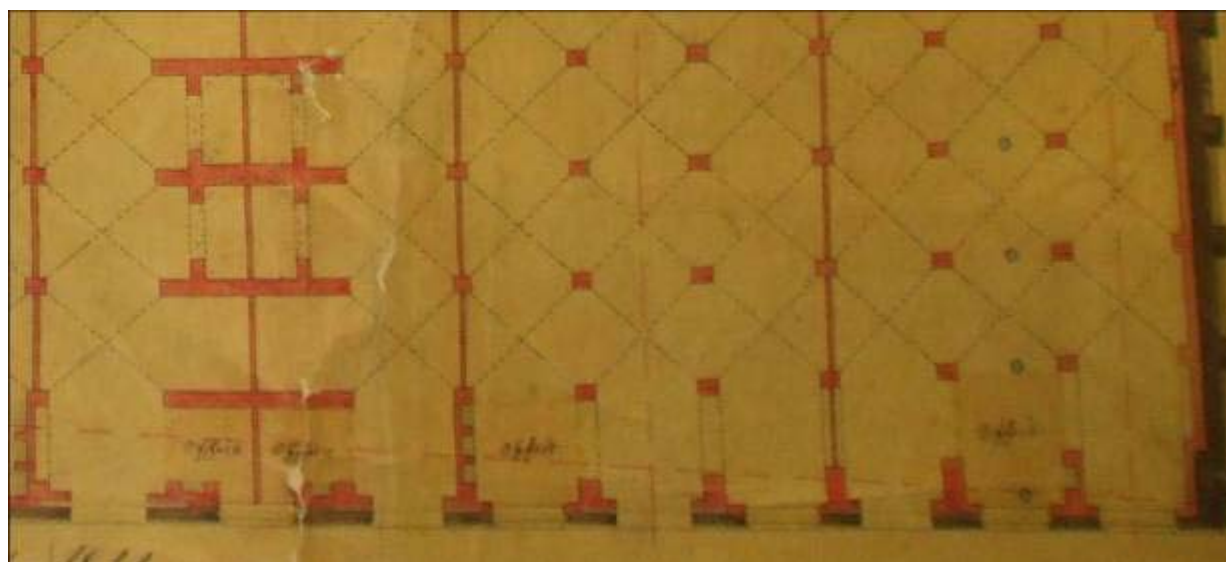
1866 architects plan of the Goods Station undercroft, showing office accommodation along the southern elevation.
